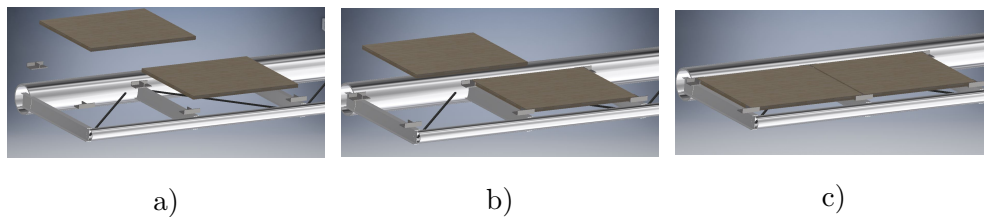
a-c) Steel frame with truss-patterned diagonal stiffeners with shelf-like supports for deck plates.
